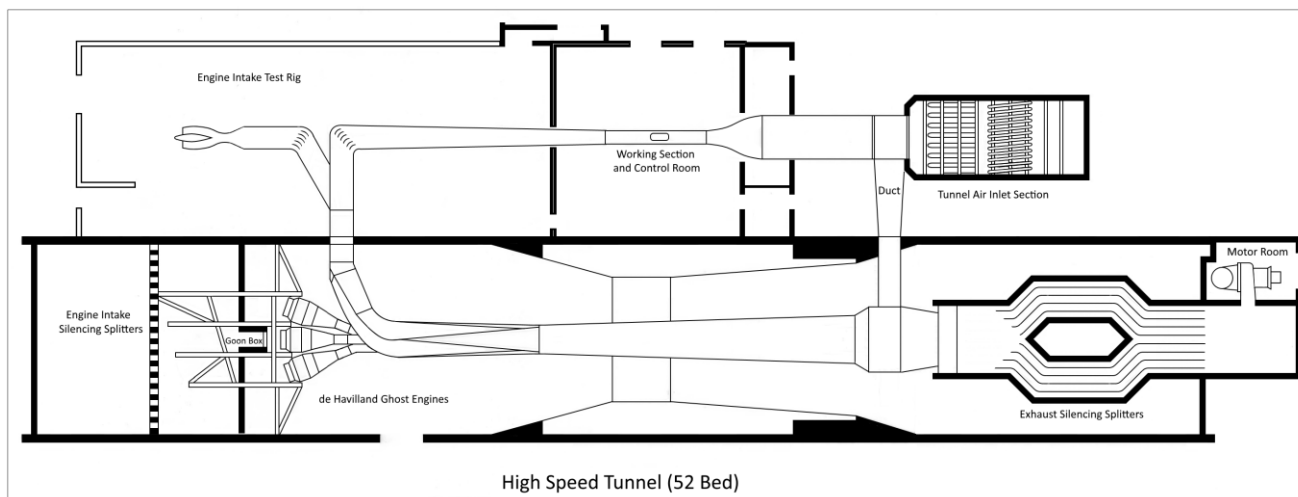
Plan of high speed tunnel with engine test rig in its original form (before extension)
